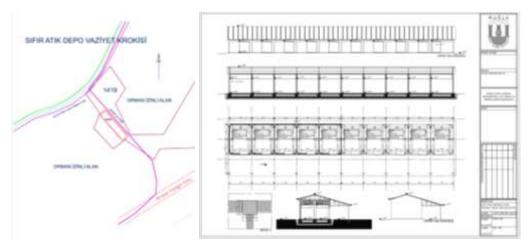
Temporary Waste Storage Layout Plan and Architectural Details
